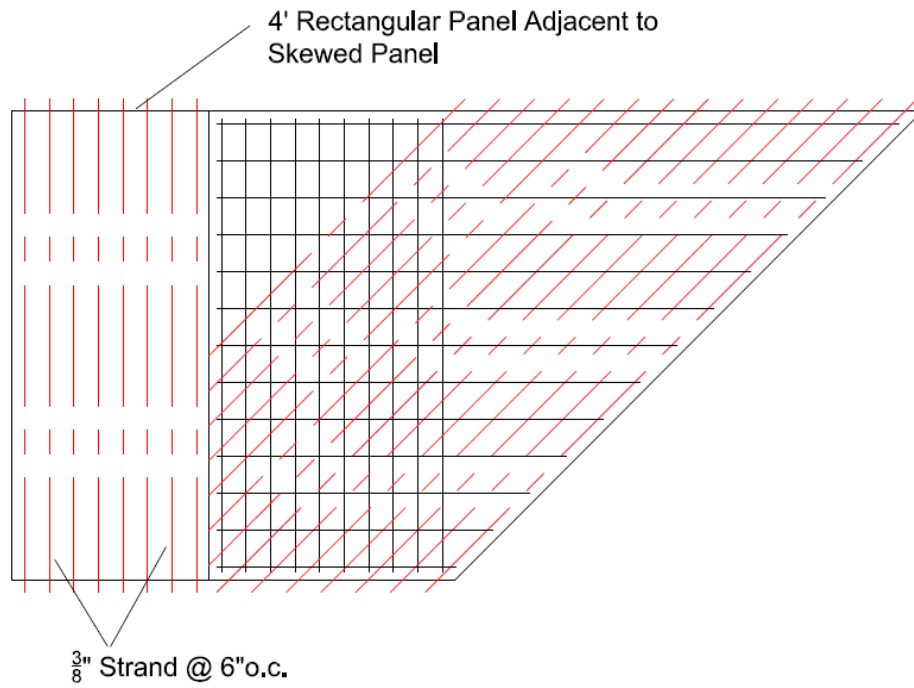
Skewed Panel Reinforcement for Specimens P30P1 and P30P2
